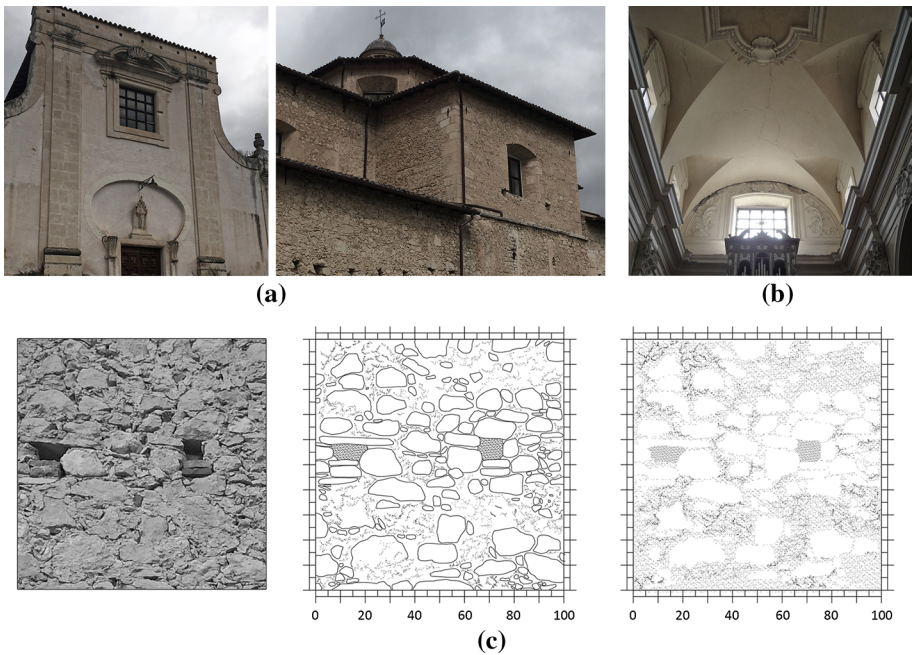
External (a) and internal (b) details of St. Maria Extra Moenia church in Petogna [AQ]; masonry pattern (c)
